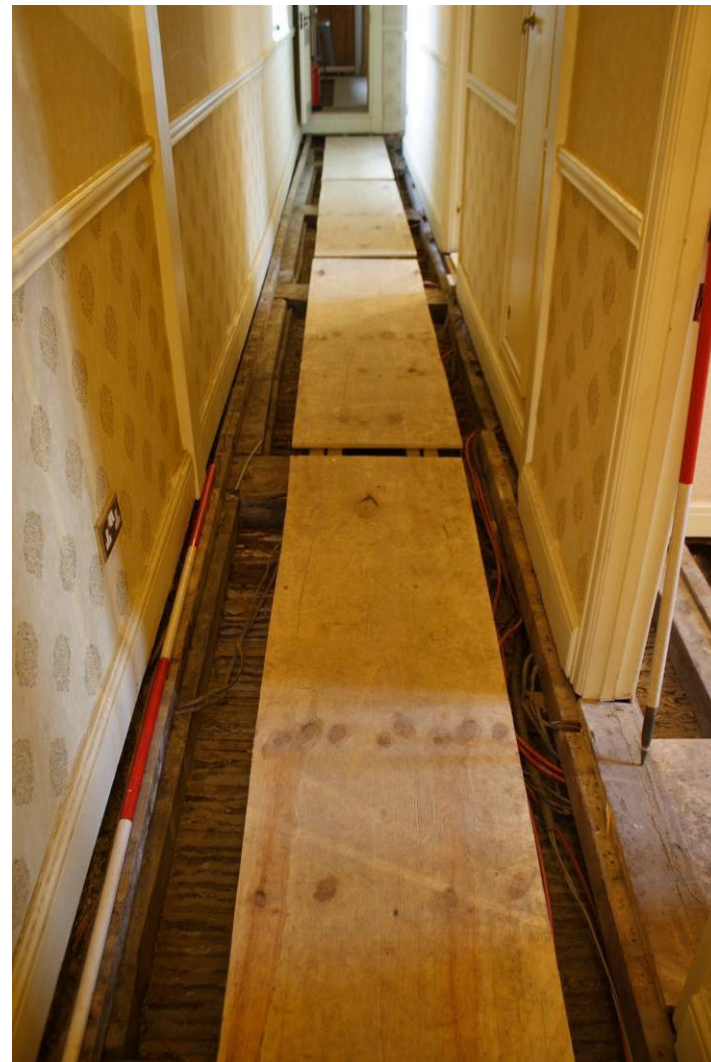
Corridor 113 following removal of floorboards, viewing NW, showing beams visible running under the fixed walkway boards
